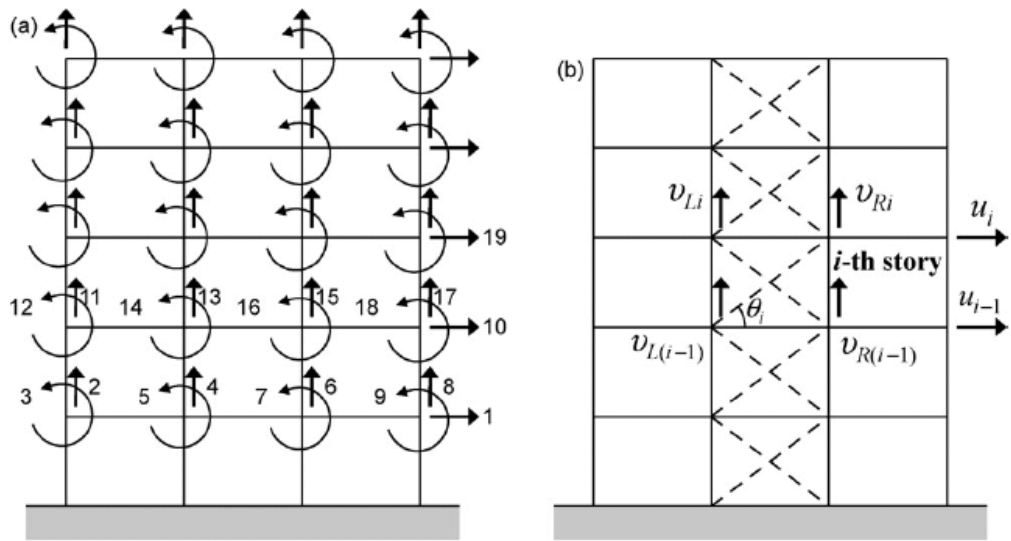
2-D planar building frame (shear-flexural building model) [5]
